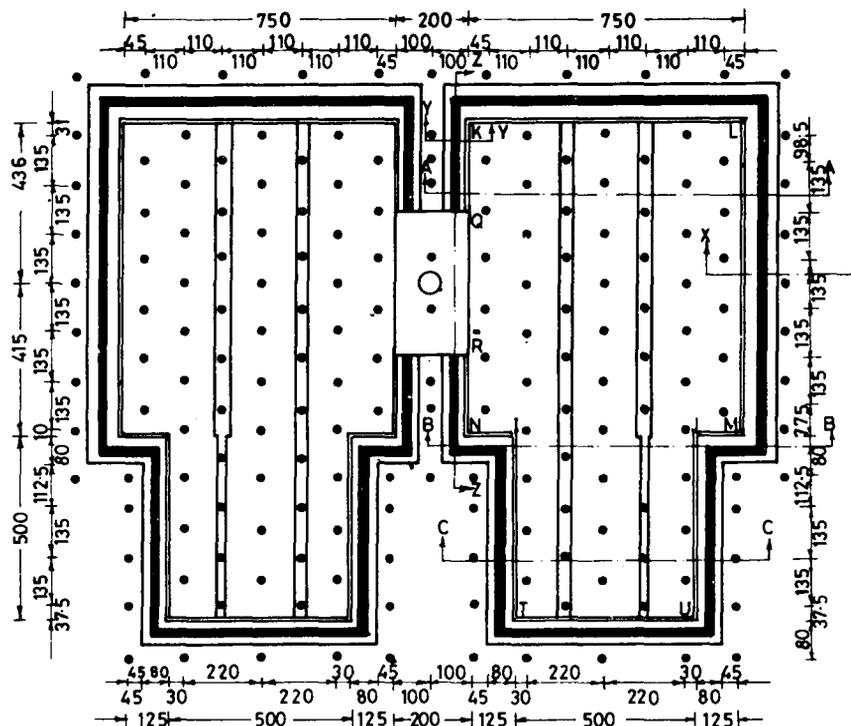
FOUNDATION PLAN SHOWING POSITION OF GRANULAR PILES AND THE SKIRT
